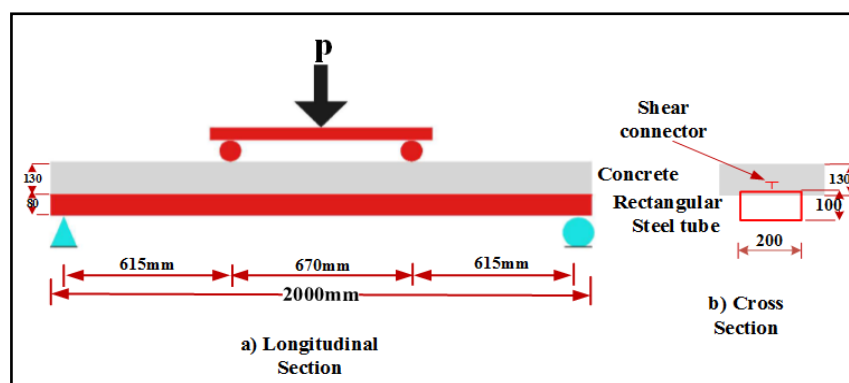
Composite Beam with Rectangular Steel Tube Section
